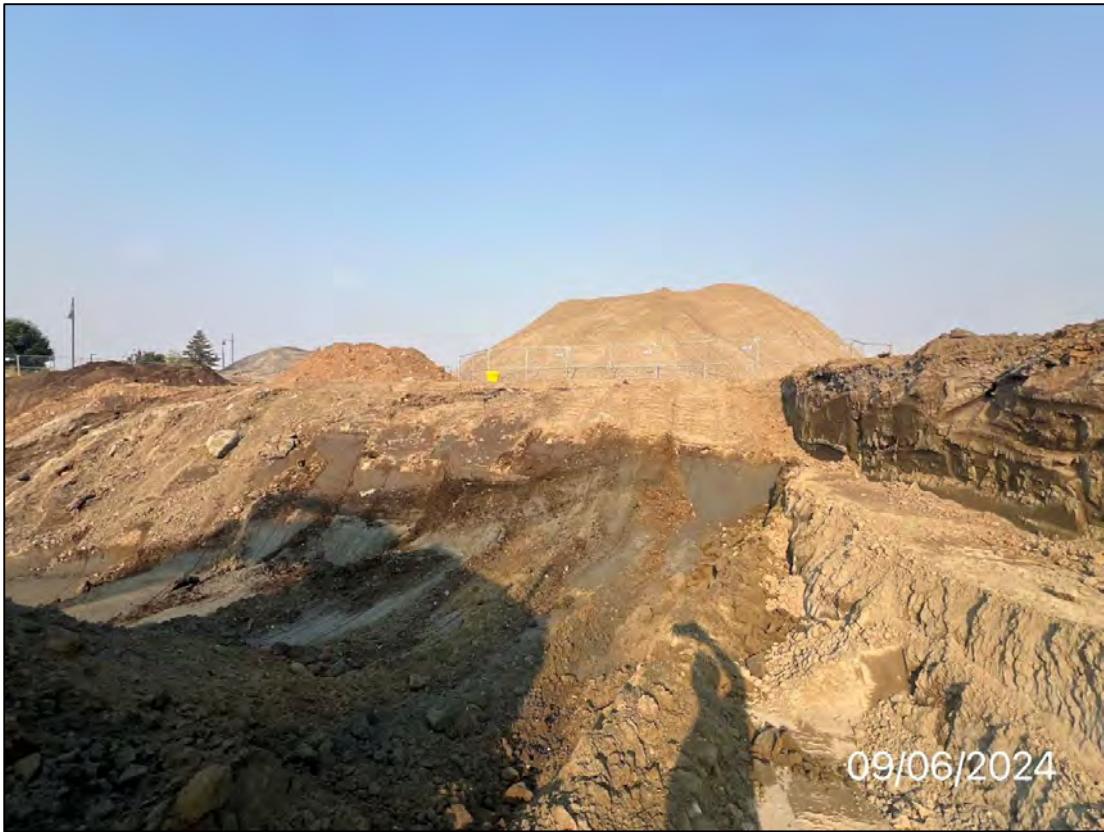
Excavation area in the vicinity of Building B, facing west, 9/6/24.
